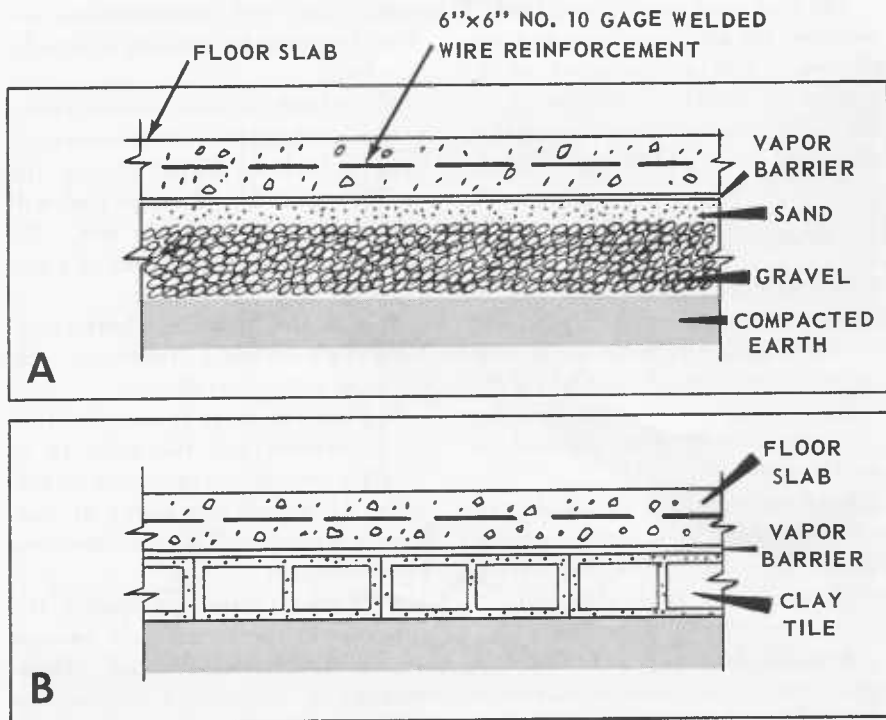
Waterproof construction of basement floor in compact or clayey soil (A) and in very poorly drained soil (B).
